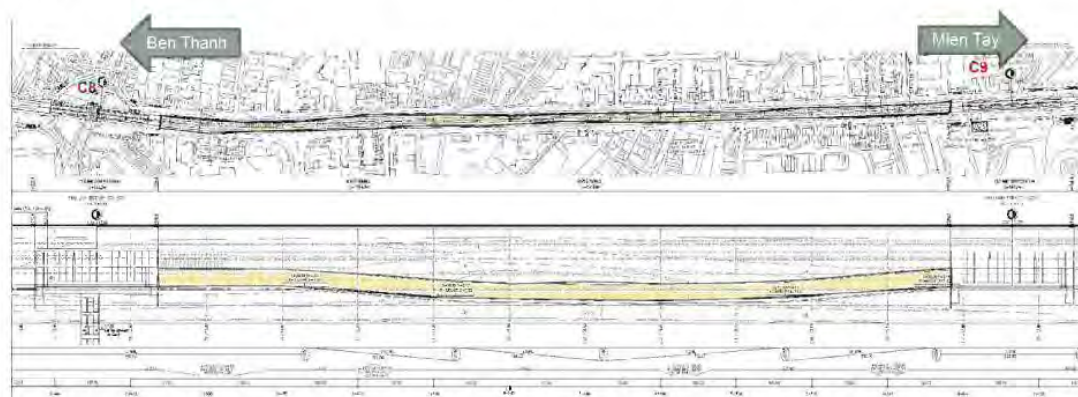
Plan and Profile between C8 and C9 on FS
